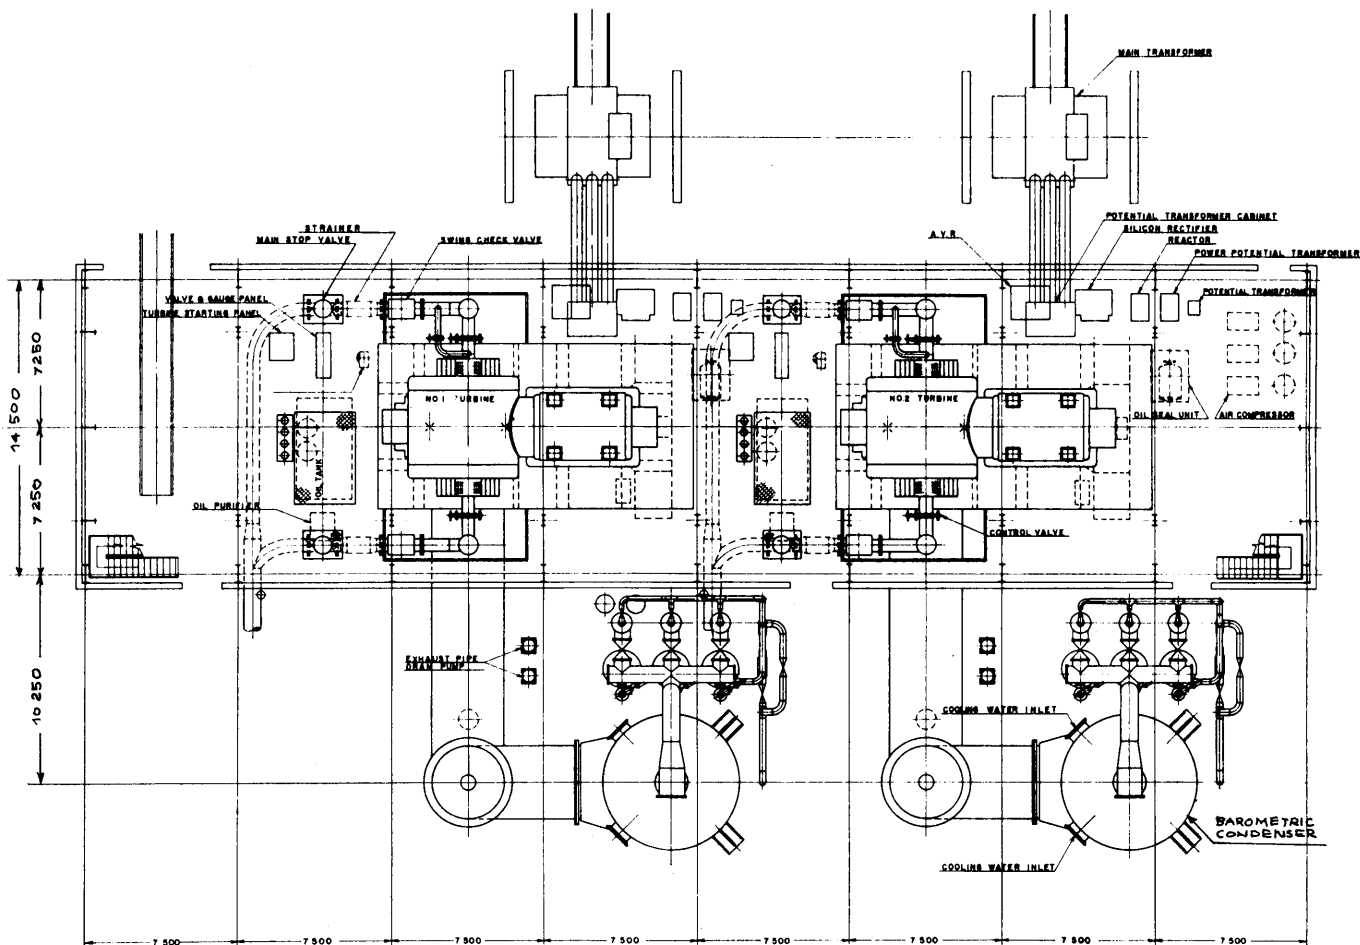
General arrangement of Cerro Prieto (Plan).
